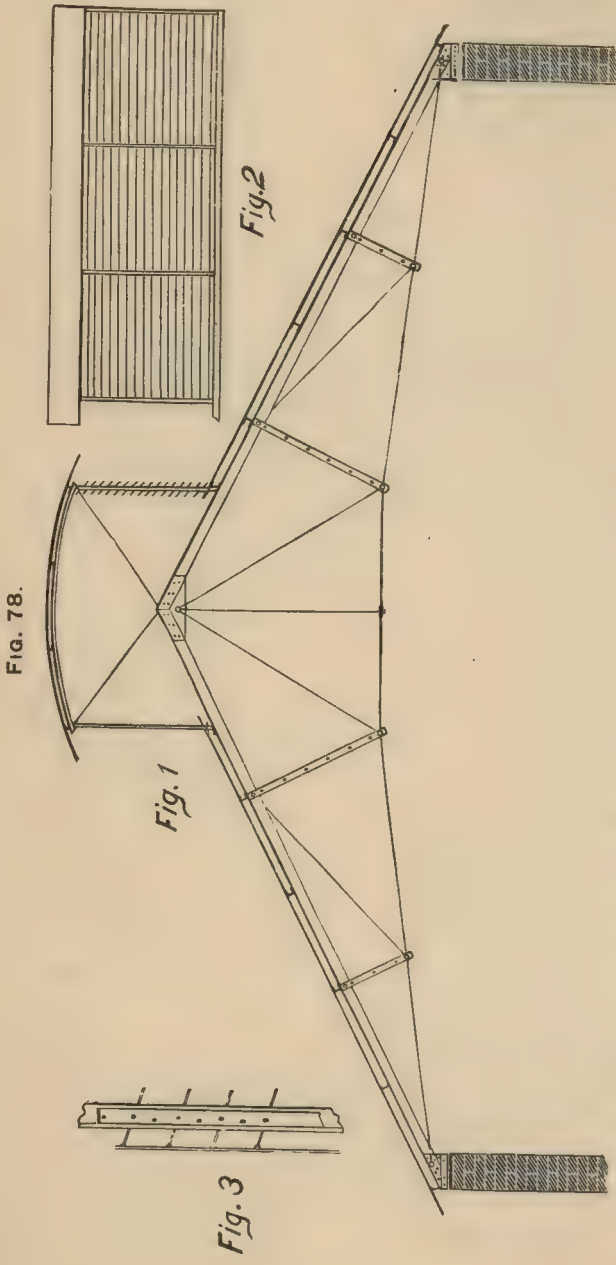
shows Iron Roof Truss, with Fig. 1 end view of Ventilator ; Fig. 2 side view of Ventilator with Slats; Fig. 3 shows sectional view of Slats. Iron Roof Trusses and Iron Buildings covered with Corrugated Iron, designed and erected. Designs and estimates furnished on application.
